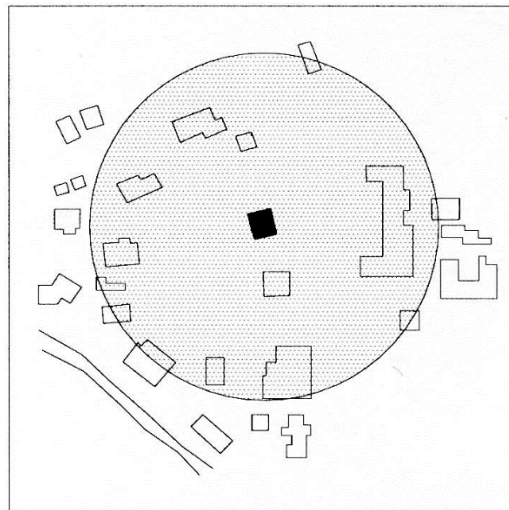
Interior Lot with No Street Frontage
